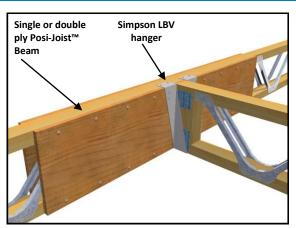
Posi-Joist™ to Posi-Joist™ Connection
